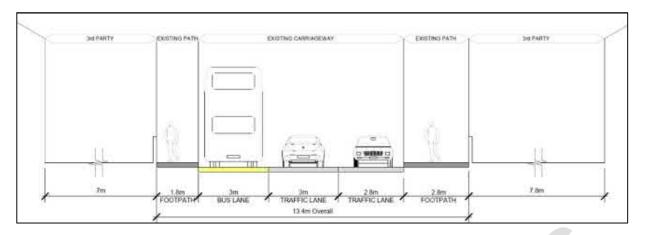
CG1e Typical Cross Section for Crumlin Road.
